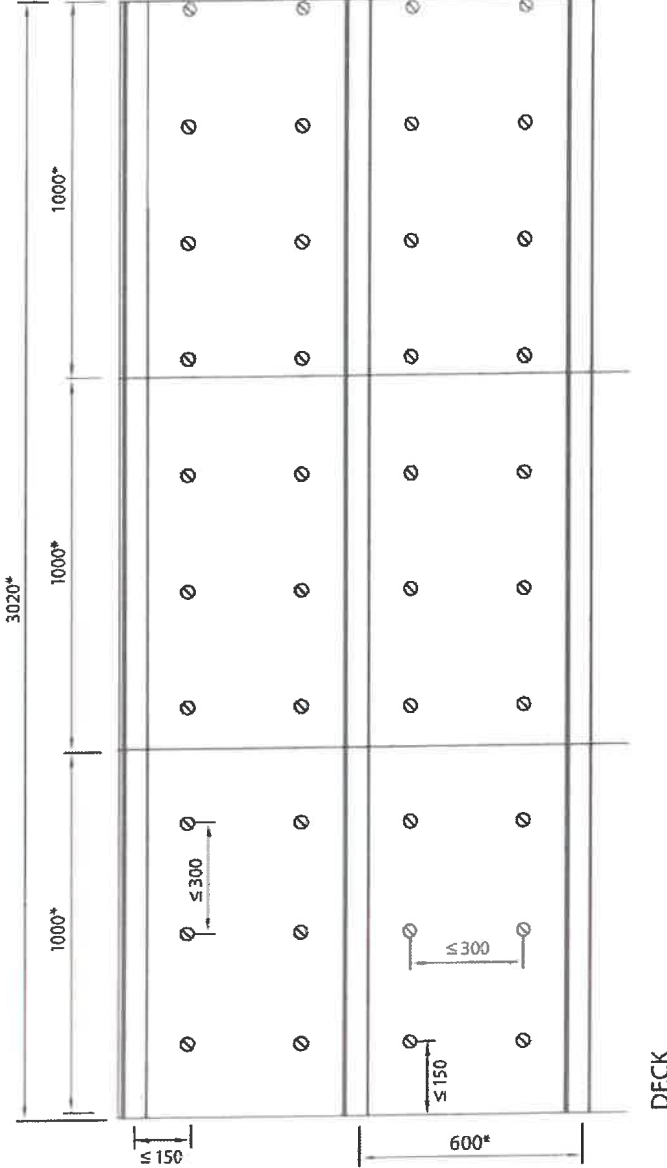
dated 29 July 2016 from the manufacturer.
